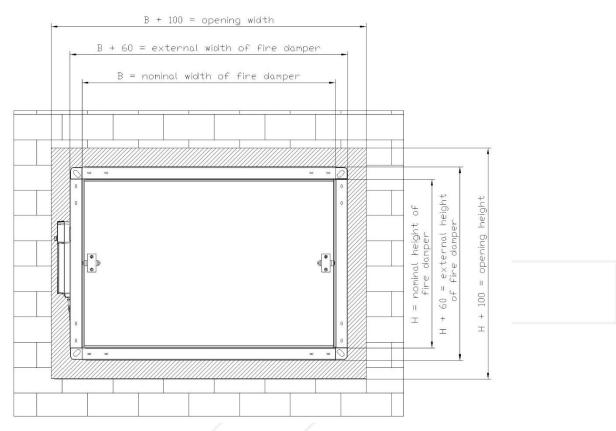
Installation method of fire dampers KWP-L in rigid wall with horizontal rotation axis of baffle
